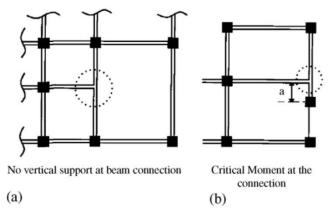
Beams Intersecting Without Vertical Supports (Ozmen and Unay, 2007)
